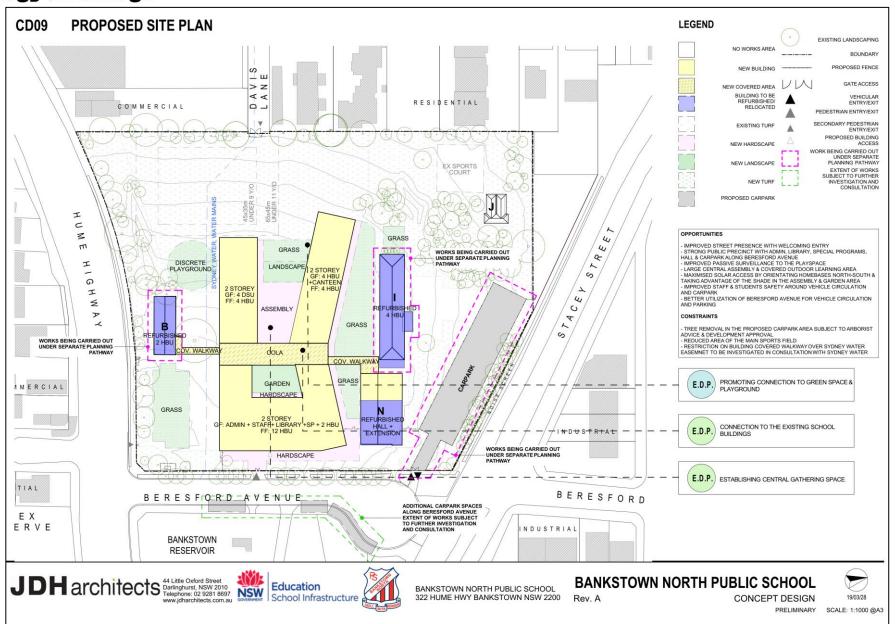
Showing the proposed works plan for Bankstown North Public School (plan courtesy of JDH Architects).
